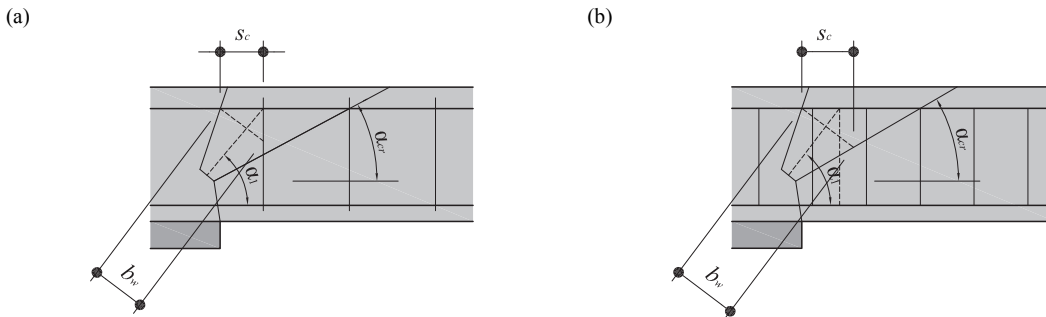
Failure of the compression strut in the case of (a) one row of shear reinforcement crossing the crack and (b) in the case of multiple rows of shear reinforcement crosses the crack
